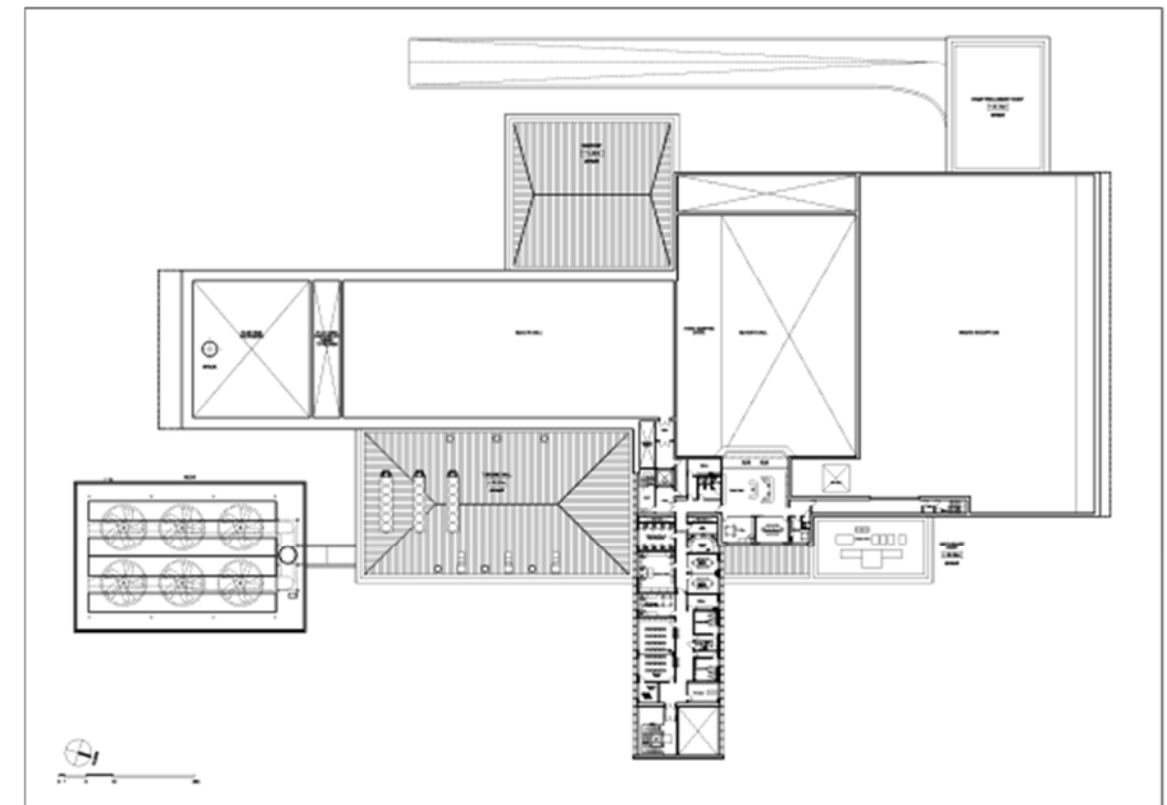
Proposed ERF level 4 floor plan - extract from drawing PL114
